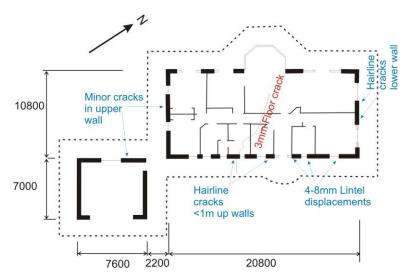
Charing Cross adobe house plan showing adobe walls and minor damage locations
